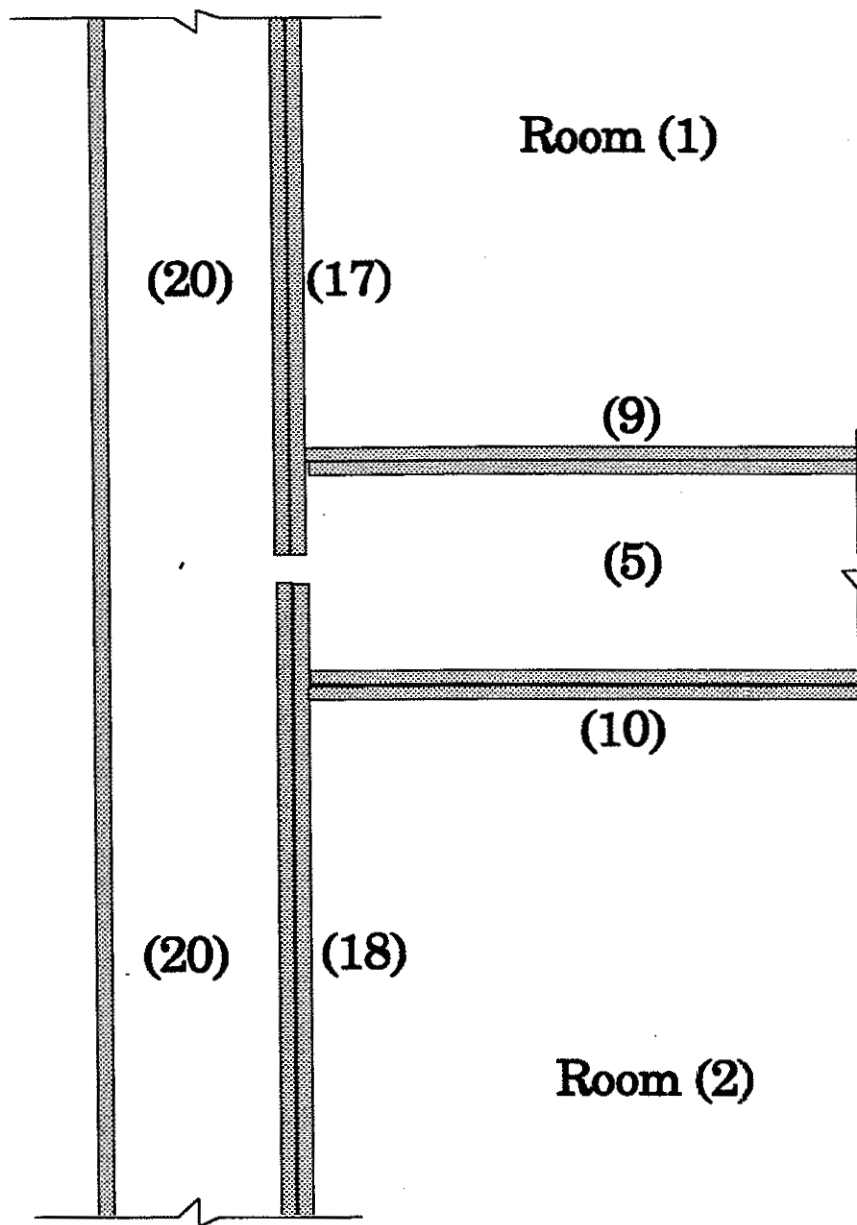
Sketch showing the sub-systems used to model the party and flanking walls of the upper rooms.
